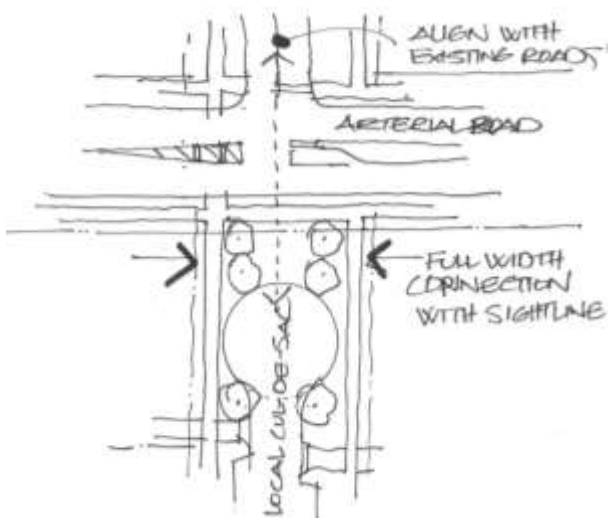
Full width street reserve connection where a local road cannot connect to a limited access major road
